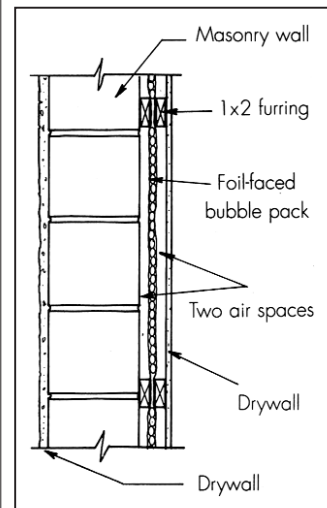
Foil-faced bubble pack on a basement wall. This approach sandwiches the bubble pack between two layers of furring strips. To attain R-8 for the bubble pack plus the two air spaces, the material must be well-sealed so there are no air leaks around the top and bottom of the bubble pack, and tightly installed so that both air spaces are maintained.
